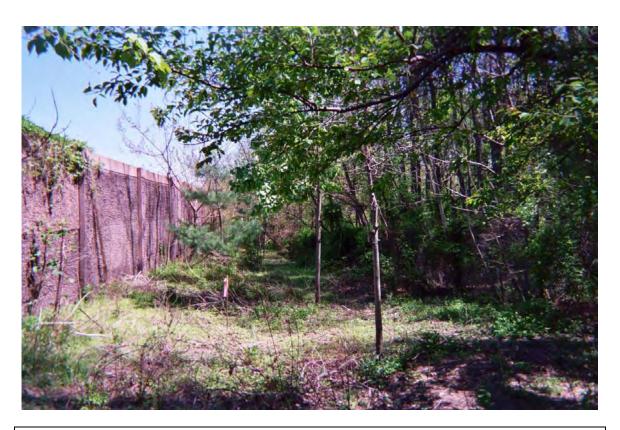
View looking east toward Wetland V data point behind noise barrier.
